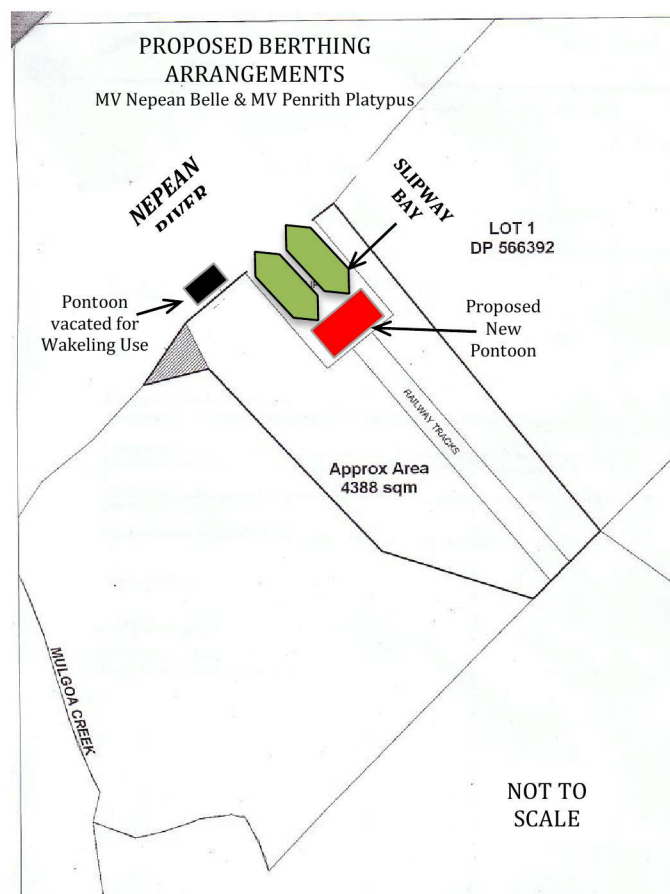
Lot 1 DP566392 - Revised Slipway Berthing Plan showing proposed Replacement Pontoon
